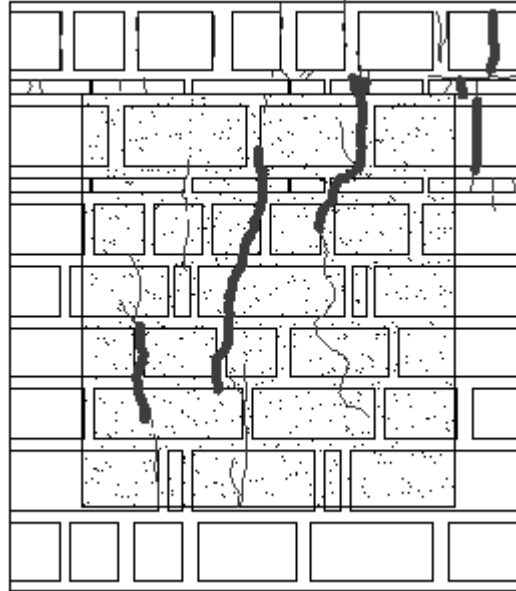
Compressive cracks in tested masonry wall (from E. Vintzilaïou – “Lecture notes on Advanced Mechanics of Masonry”)
